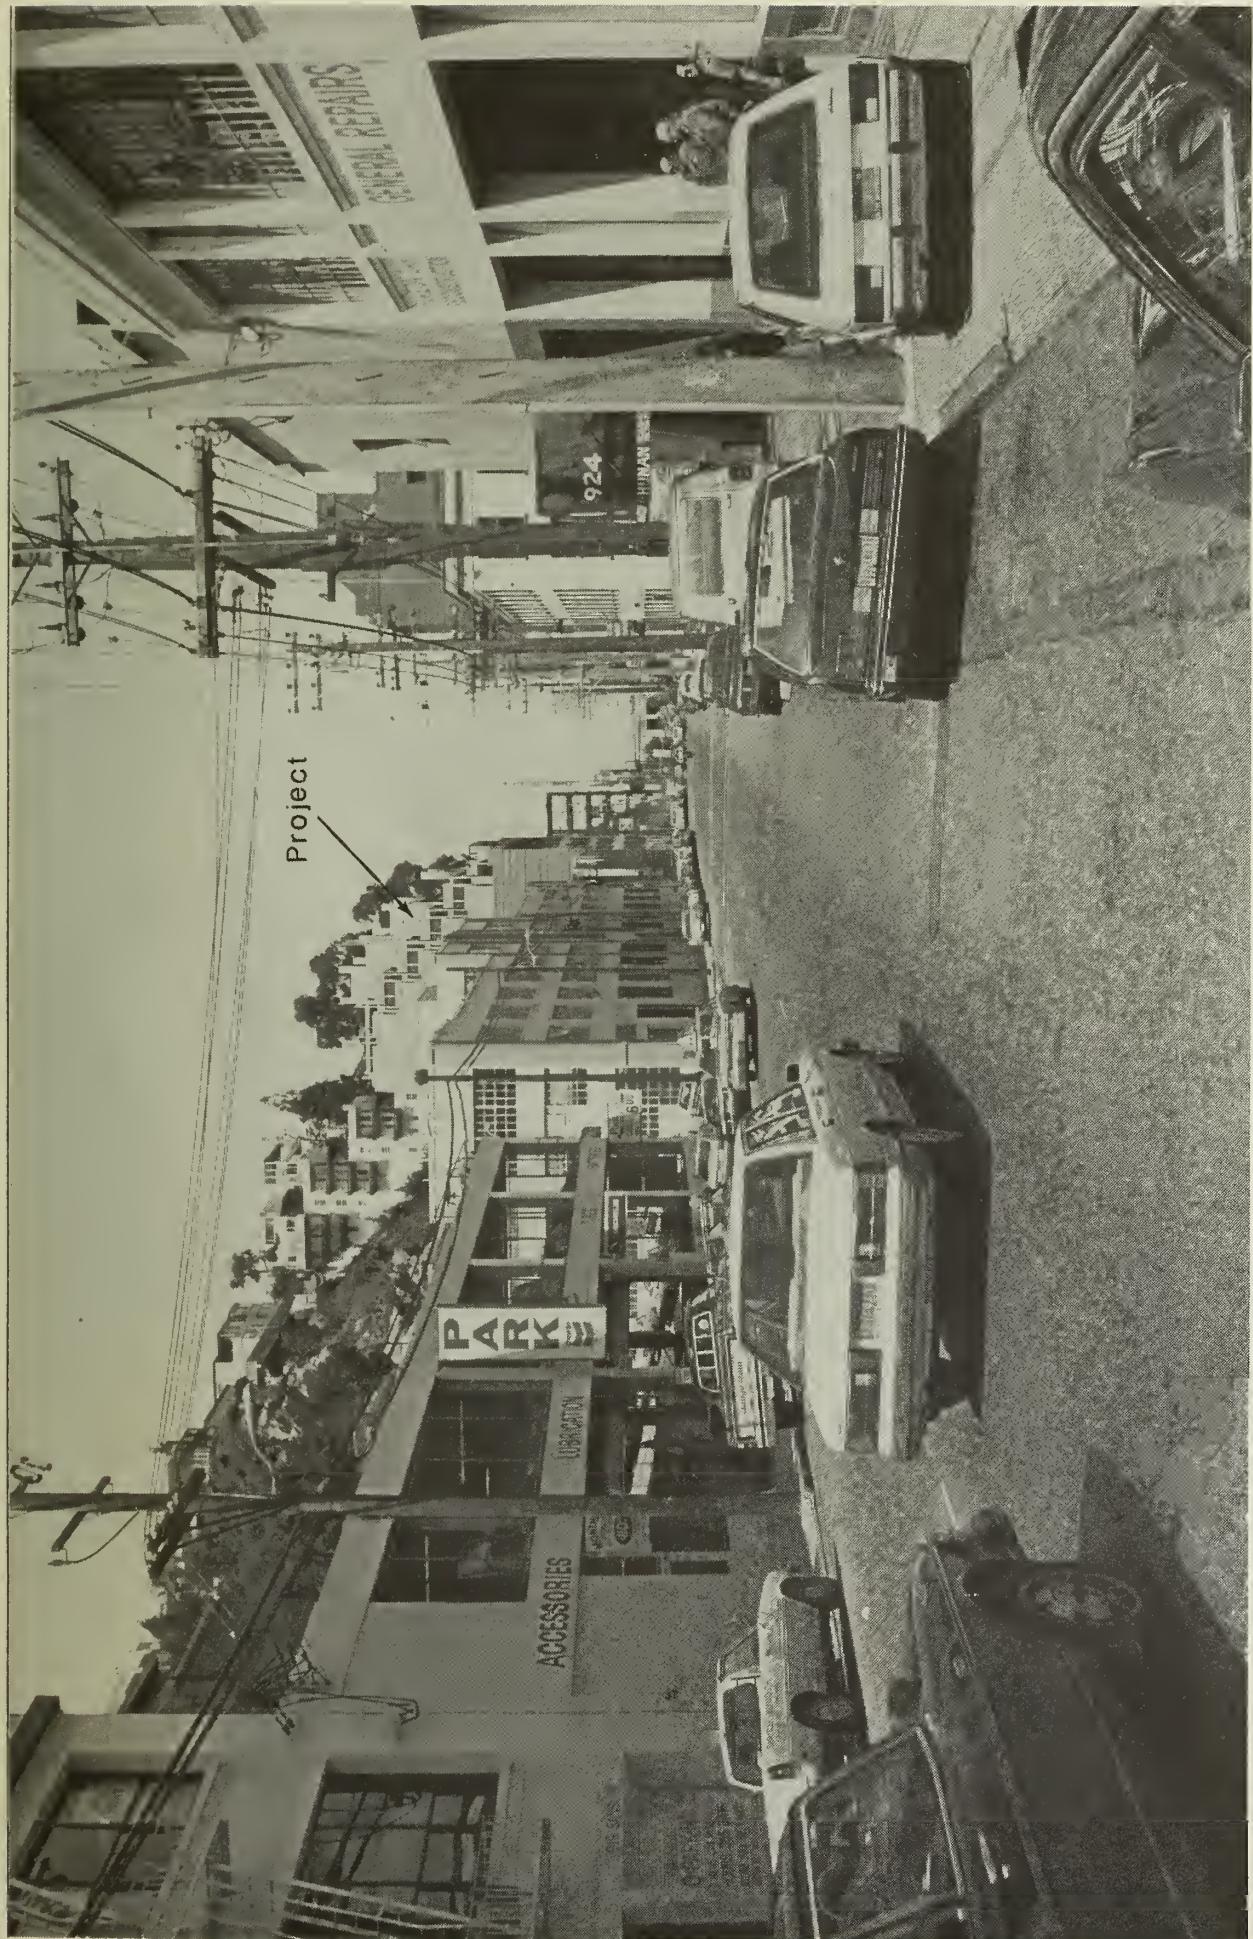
PHOTOMONTAGE OF THE PROJECT FROM SANSOME STREET LOOKING NORTHWEST
